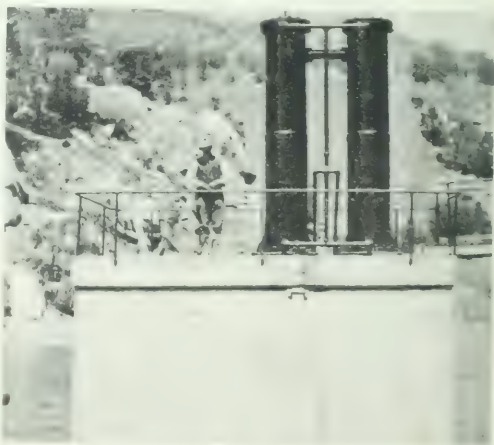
DRAINAGE TUNNEL GATE AND SLUICING TUNNEL.
